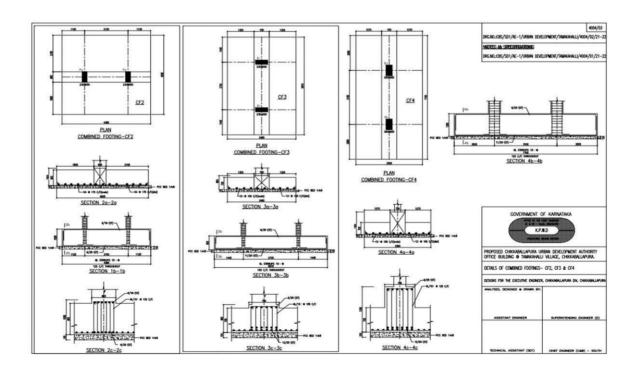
REINFORCEMENT DETAILS OF FOOTING
